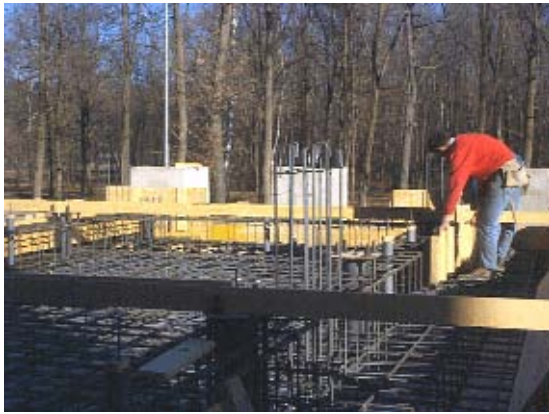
Base foundation reinforcement (general view) and reinforcement of the columns (lap-splice at the columns base)
